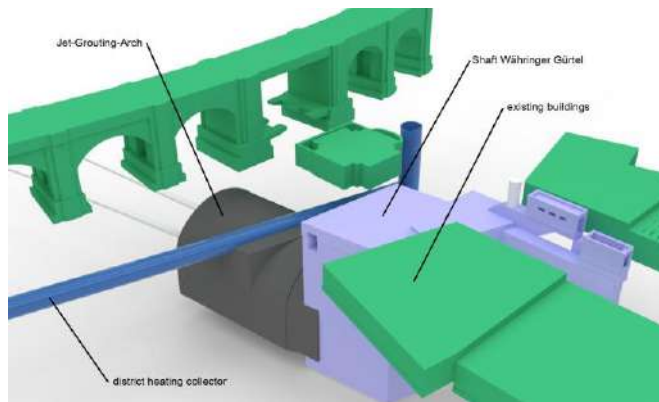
Overview of the Währinger Gürtel area (Source: IGT Geotechnik und Tunnelbau).
